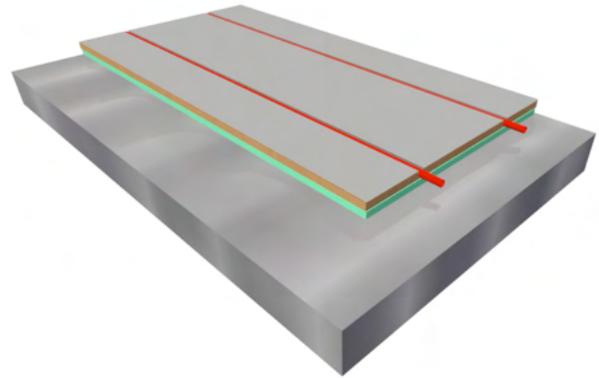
Ecowarm® Radiantboard EPS™ installed over concrete subfloor
